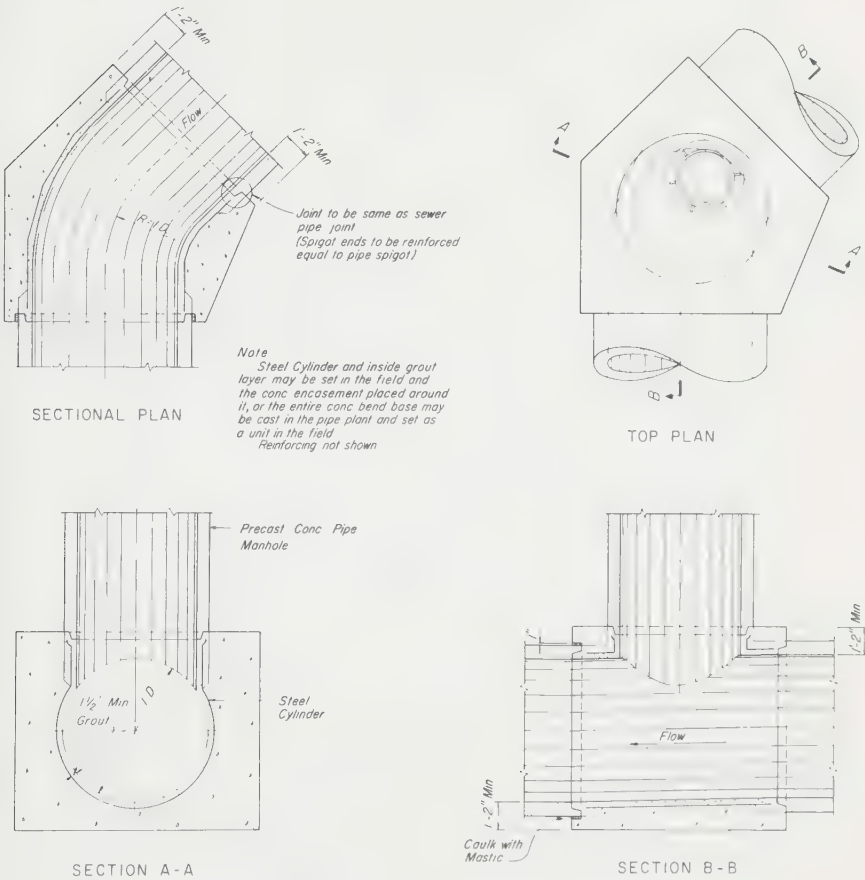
Typical special bend manhole for sewers 48 in. and larger in diameter.
